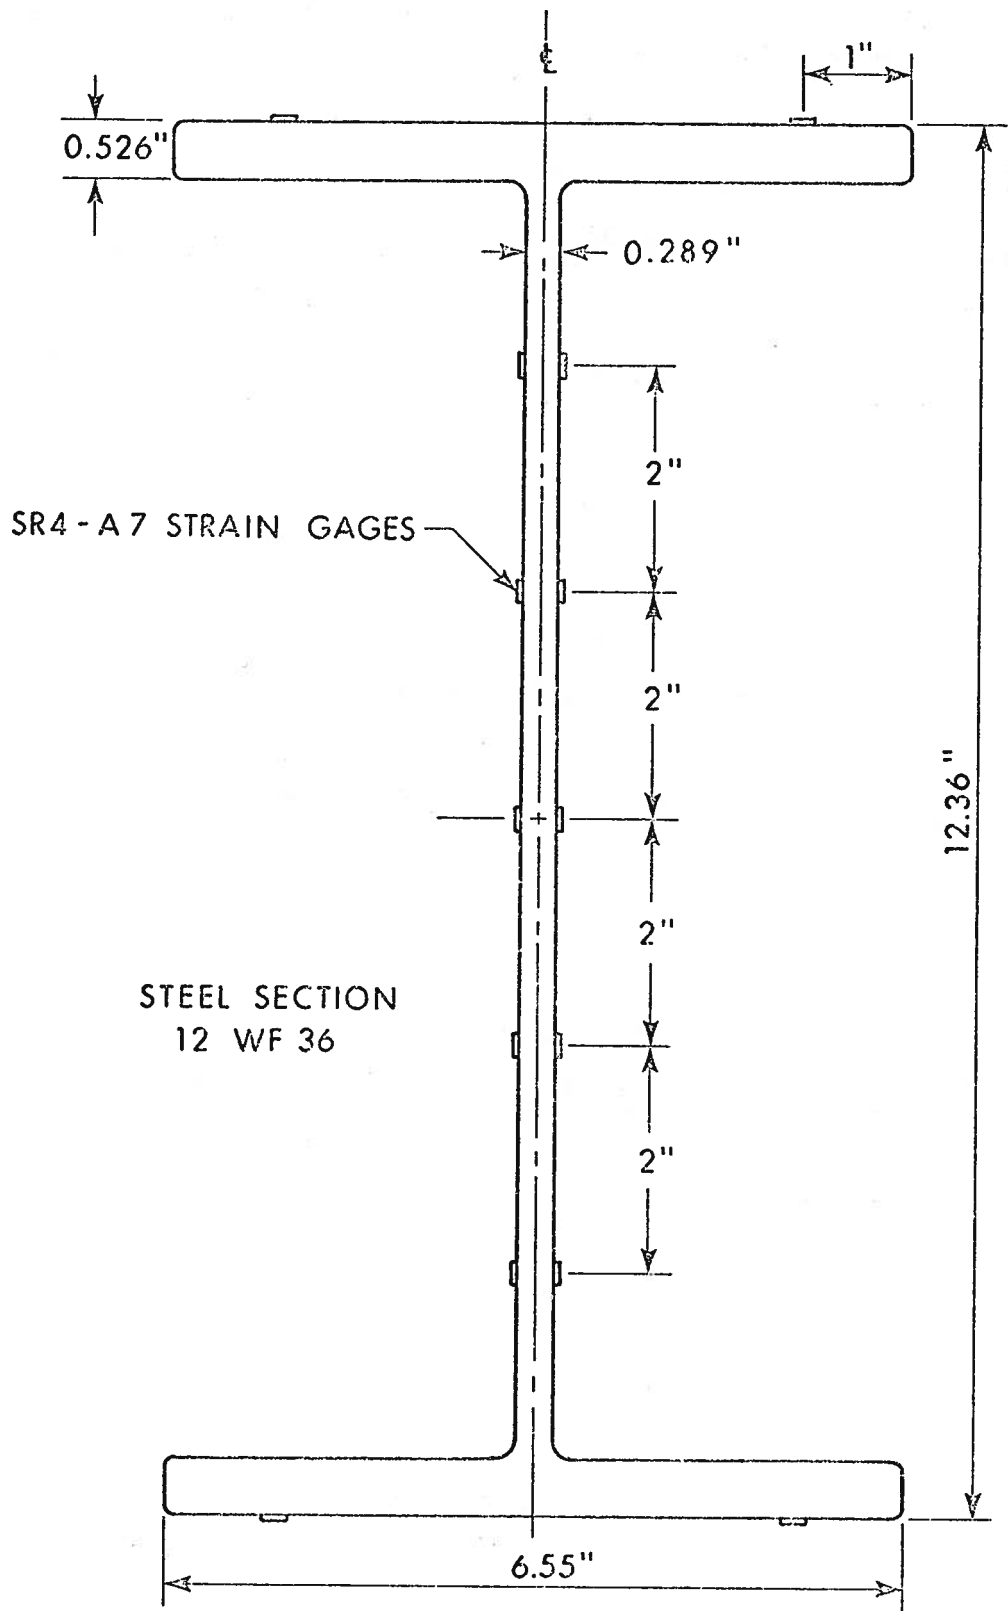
LOCATION OF STRAIN GAGES ON STEEL SECTION
